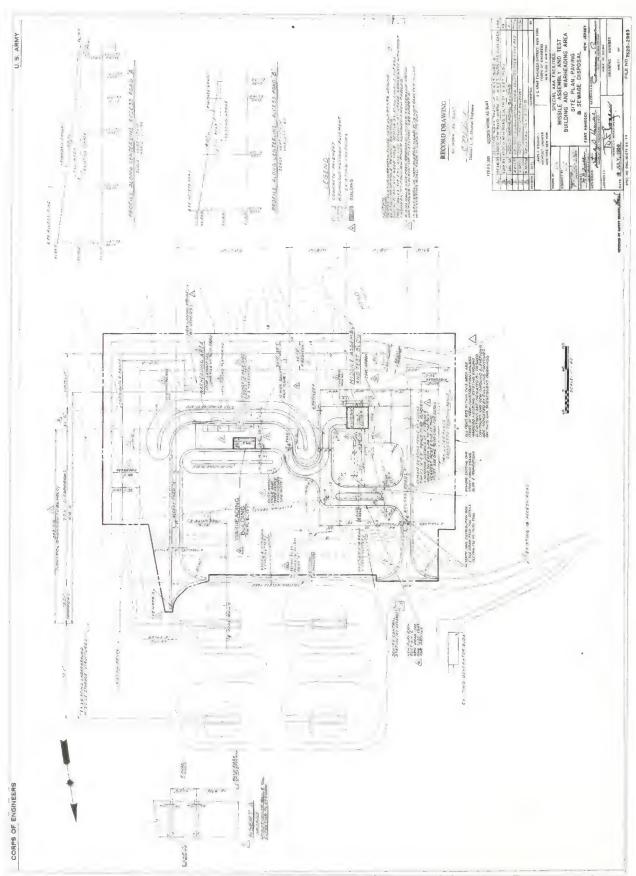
Missile Assembly and Test Building and Warheading Area, Site Plan; Paving and Sewage Disposal, 1958. Updated with "as built" information dated February 23, 1961, this plan shows alterations made to the Missile Maintenance Area for the larger Hercules missile (GATE 7620-2983).
